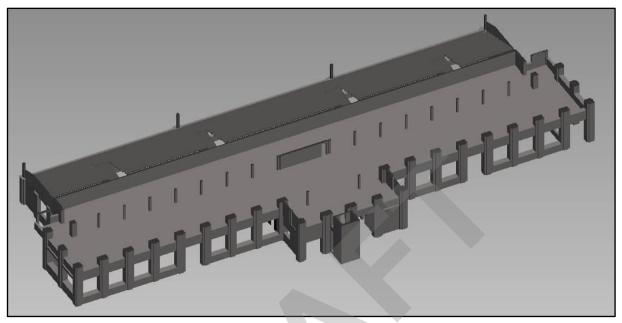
Cutaway showing walls and columns at the first floor level at GNS
